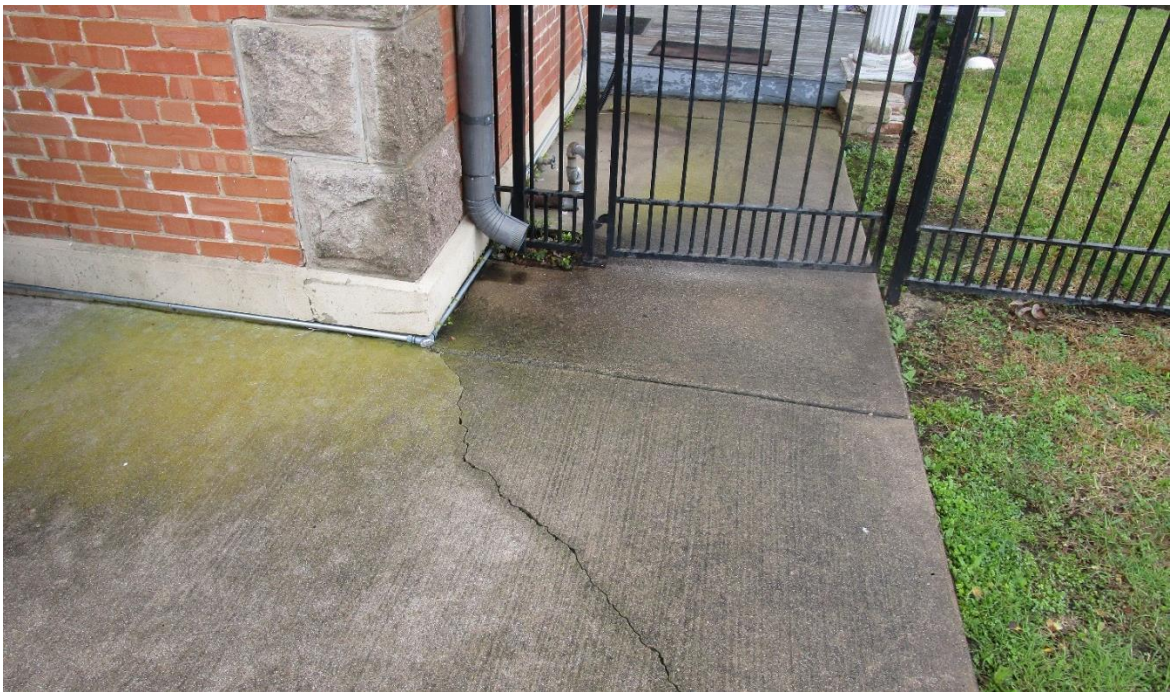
Downspout discharging next to the building. Large crack in the sidewalk and the cracks in the brick are likely due to the water from the downspout being discharged next to the foundation.
